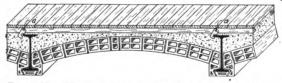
Typical segmental arch with cinder concrete fill and wood sleepers for nailing floor to
